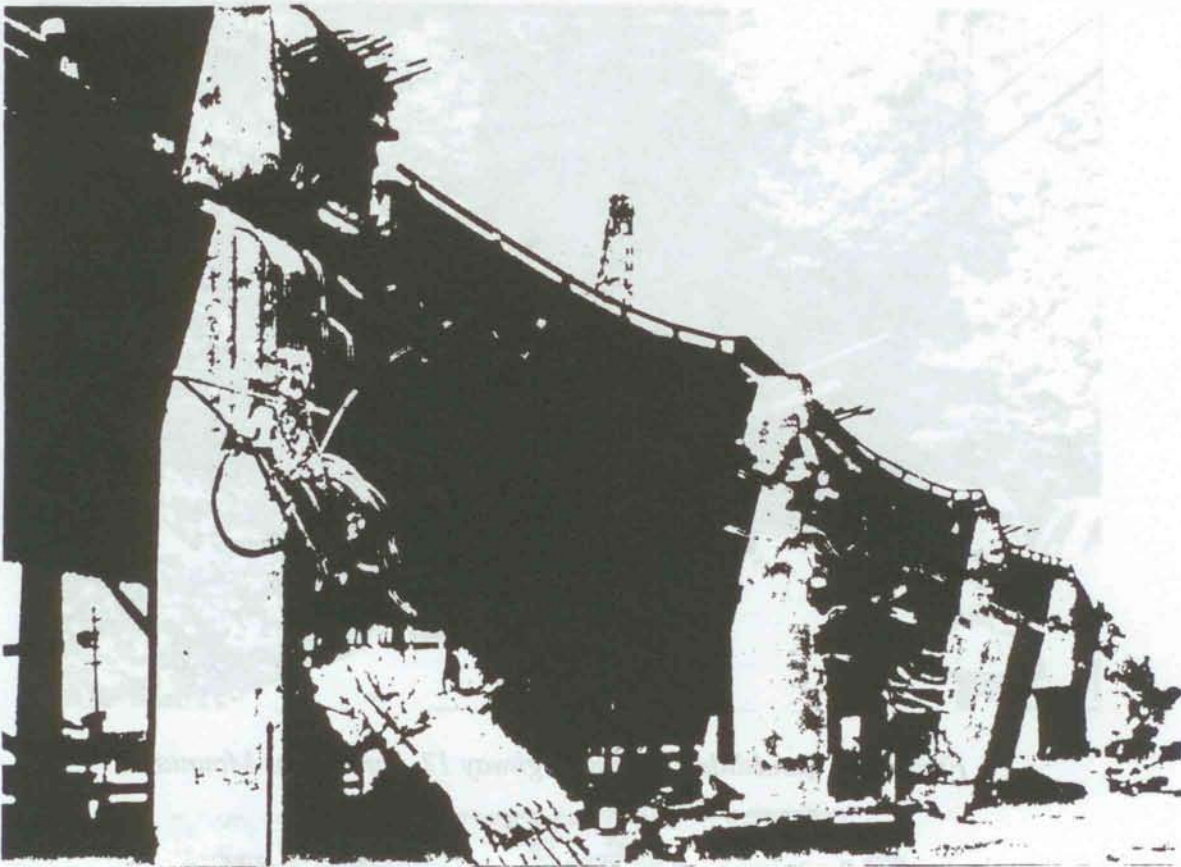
Collapsed steel rebar and concrete columns, I-880 Cypress structure, Oakland
